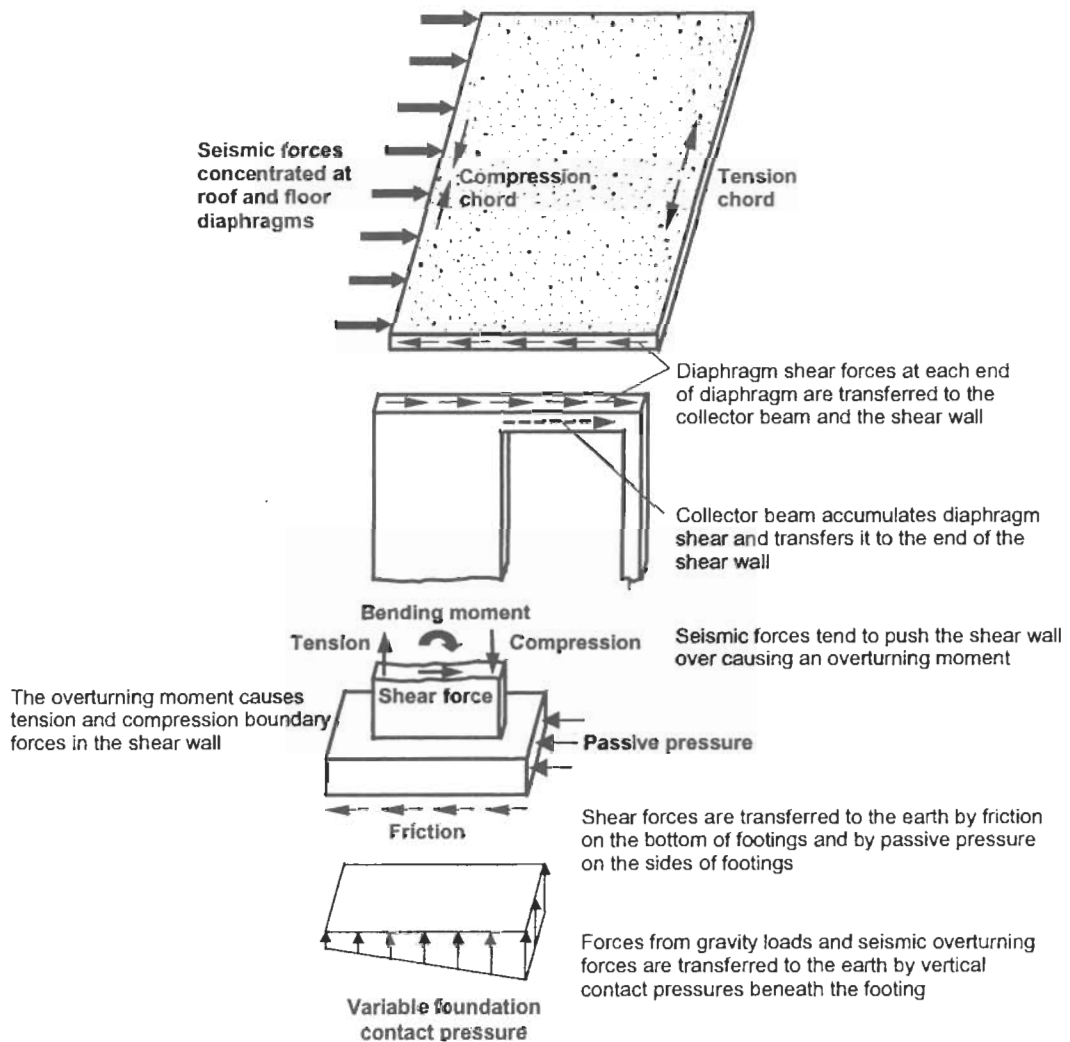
Load Path of Seismic Forces in a Concrete Building
